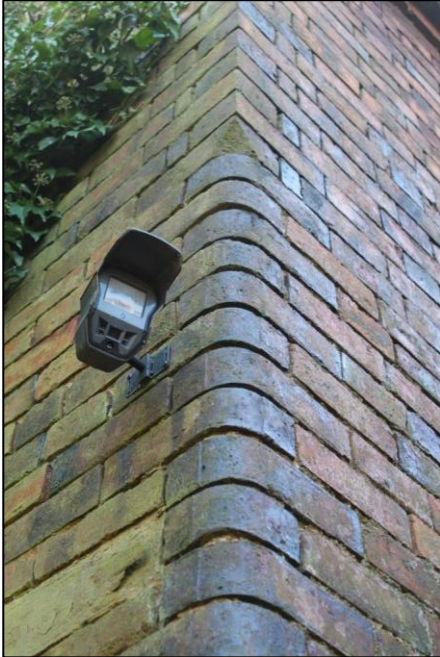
Bull nose and chamfered brick detail on the north-western corner of Building 3.
